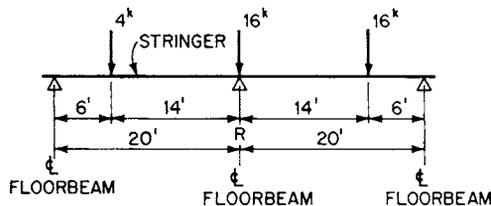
Positions of loads on a stringer for maximum live load on a floorbeam.
